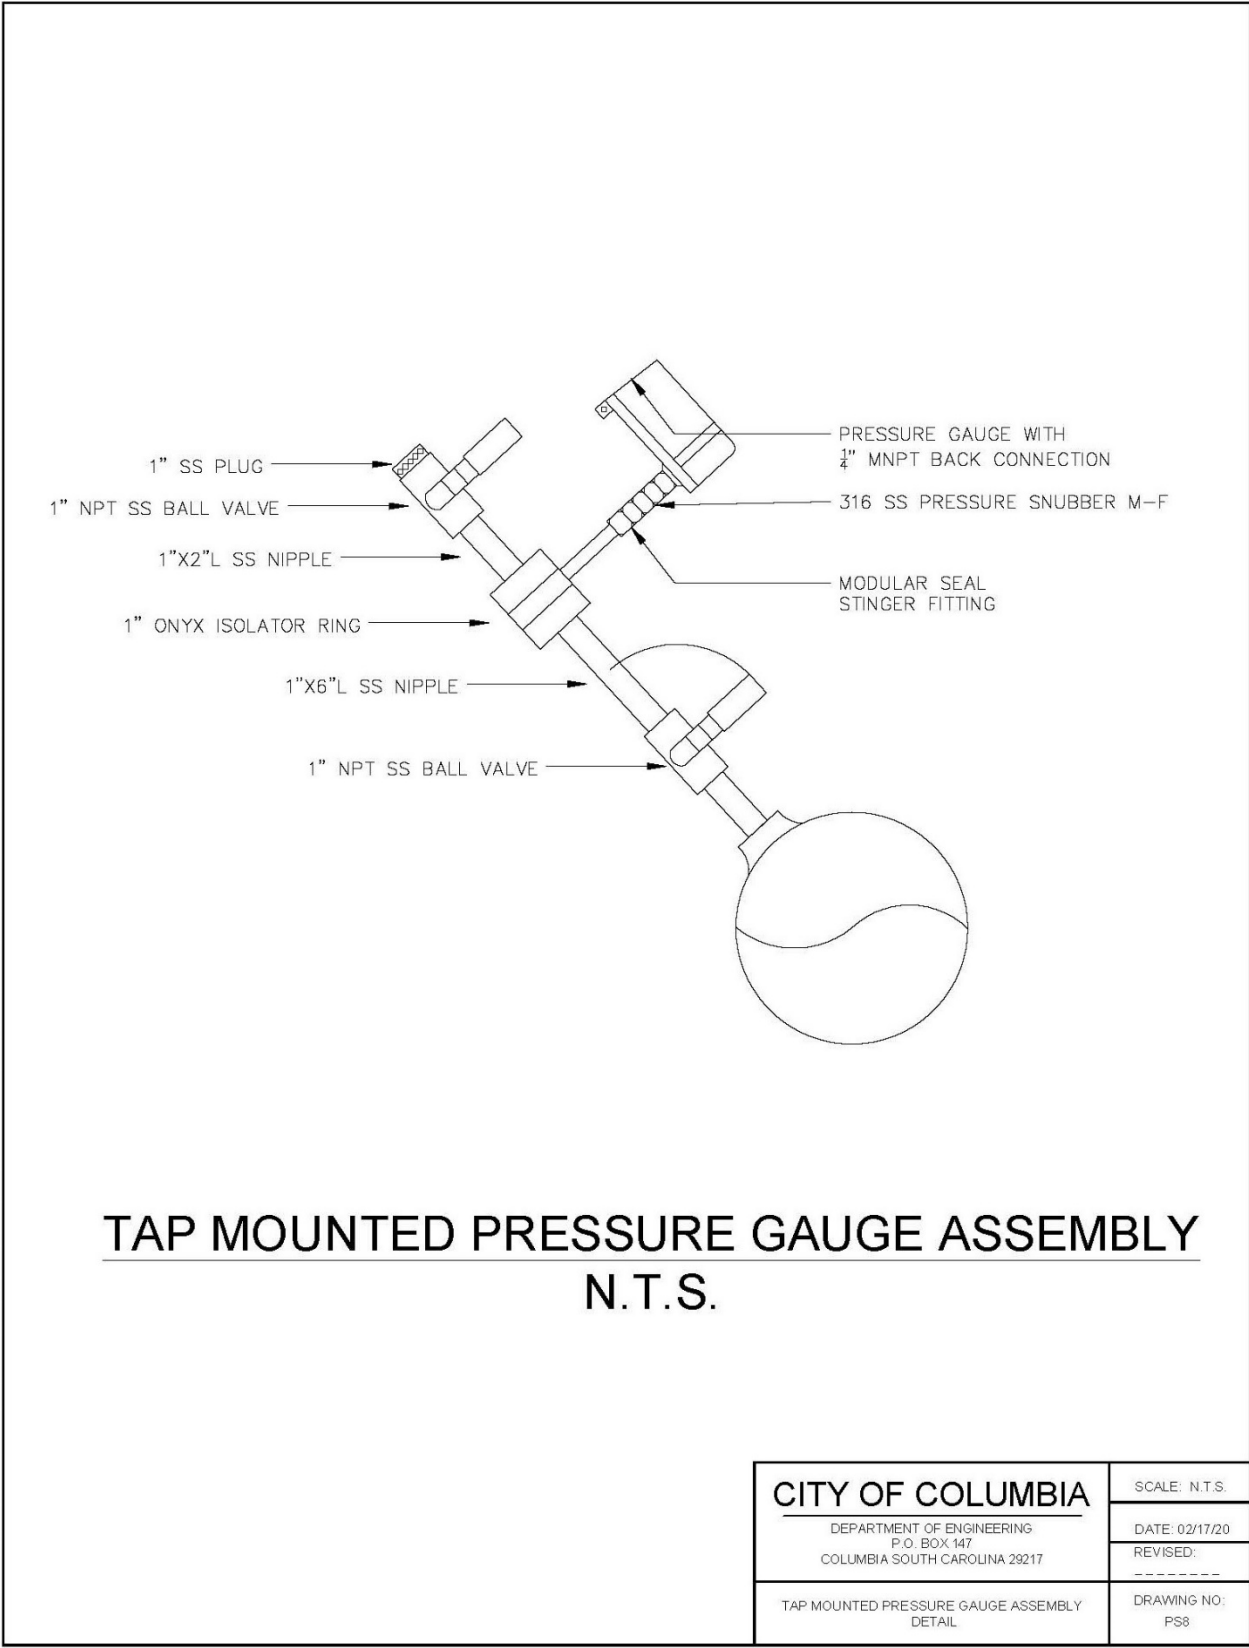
PS8 - Tap Mounted Pressure Gauge Assembly
